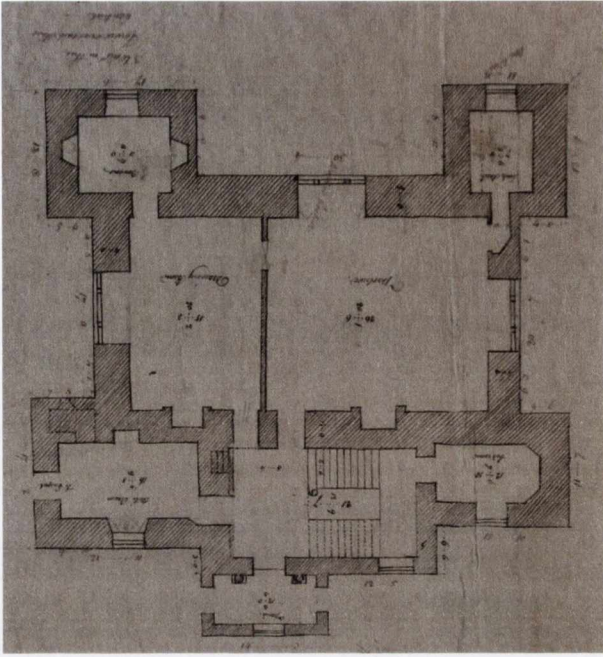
Killeen Castle, survey, ground floor plan, attrib. Francis Johnston, n.d., IAA, RIAI Murray Collection, 92/46.895, courtesy of the Irish Architectural Archive.
